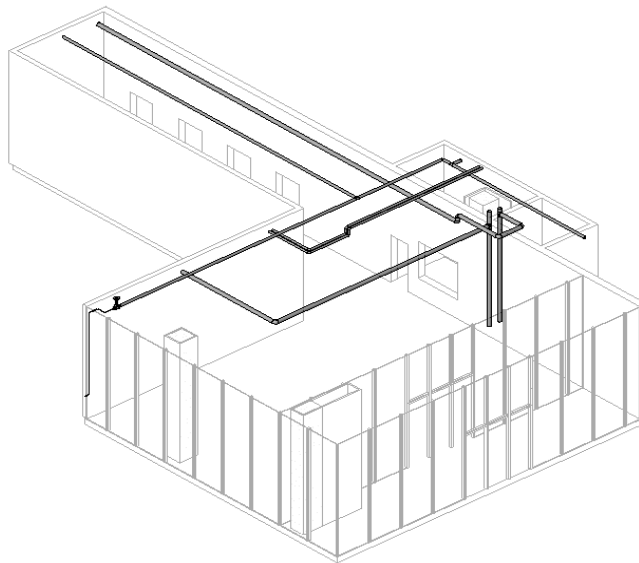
Lobby model with mechanical piping, stormwater, & fire protection plumbing systems installed.
